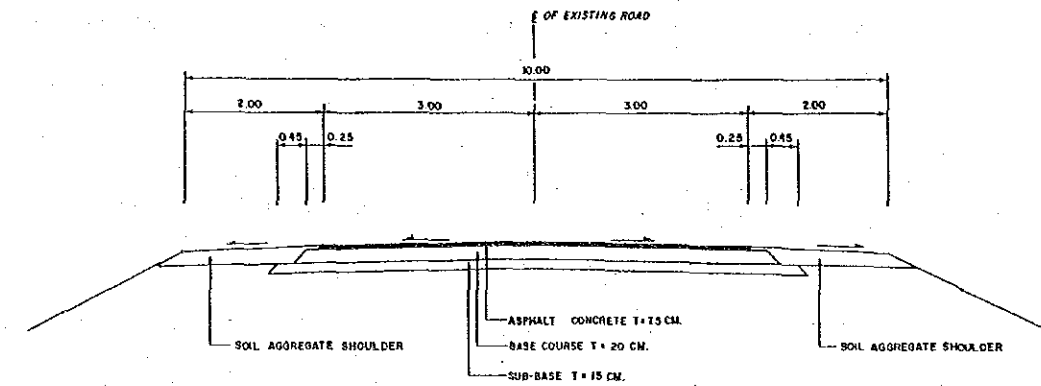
FIGURE TYPICAL PAVEMENT STRUCTURE FOR FLEXIBLE PAVEMENT IM-22
